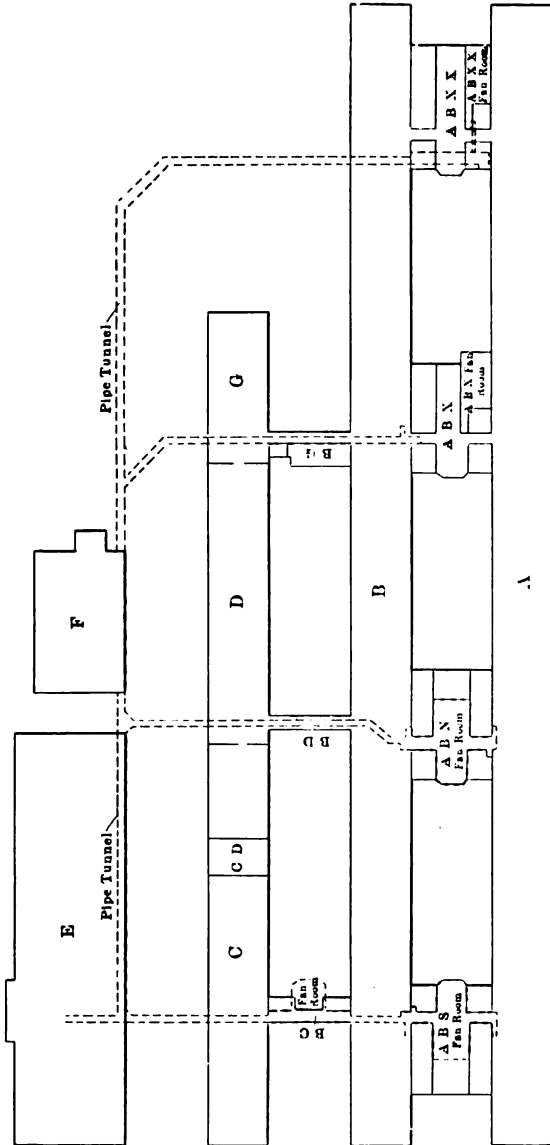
PLAN OF BUILDINGS WHEN PRESENT ADDITIONS ARE COMPLETED
